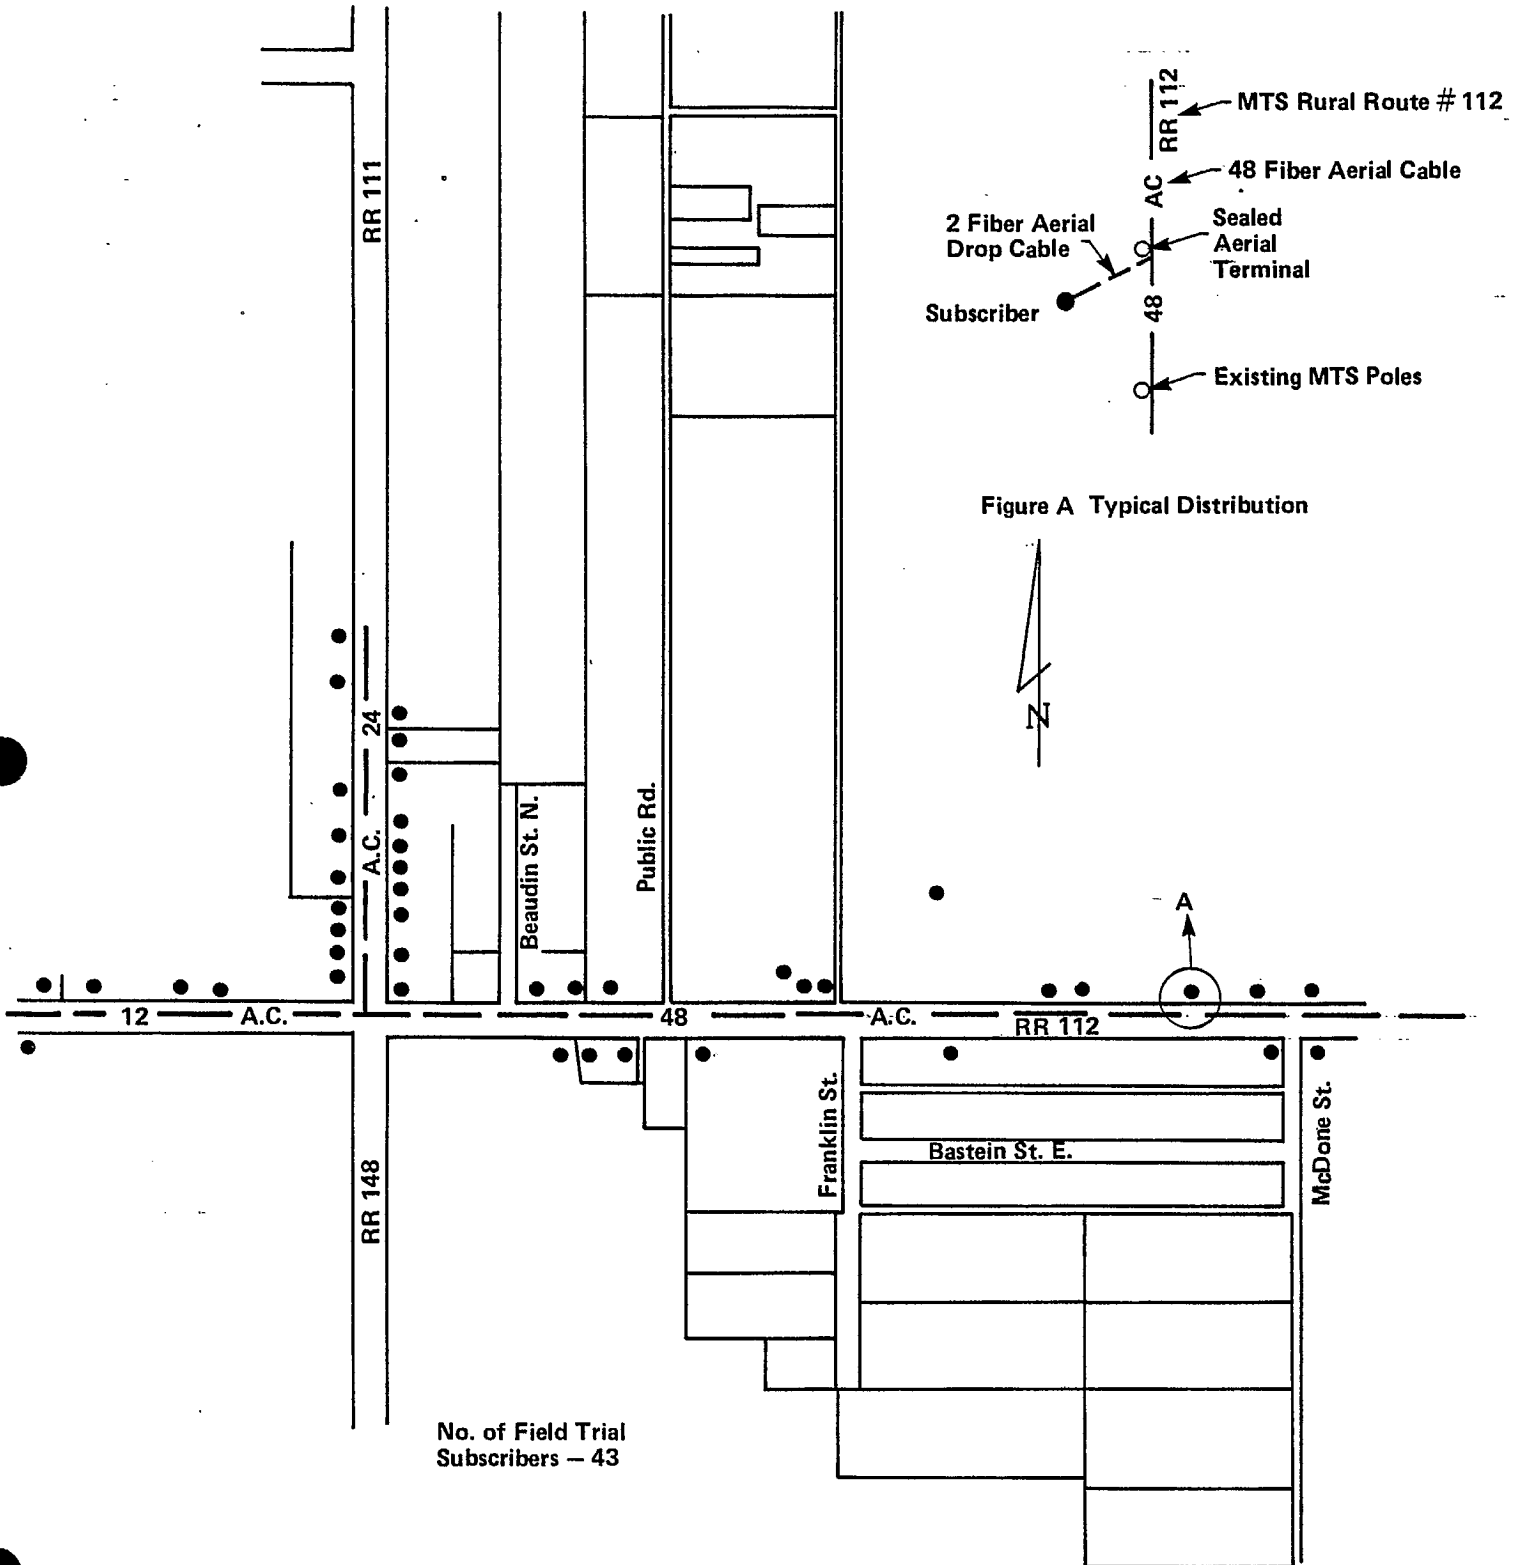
Phase 2 Outside Plant Route Details – Village of St. Eustache
